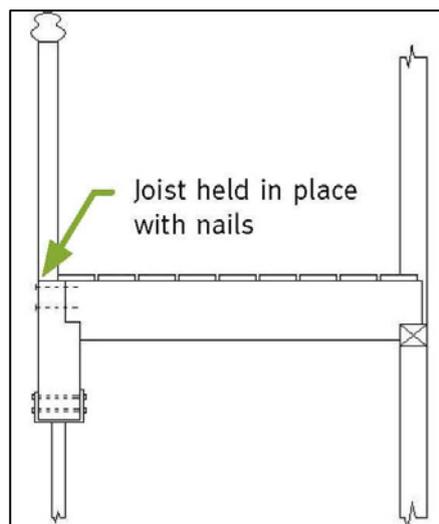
Pre-1940s deck construction with a cogged out beam holding the joist with nails.
